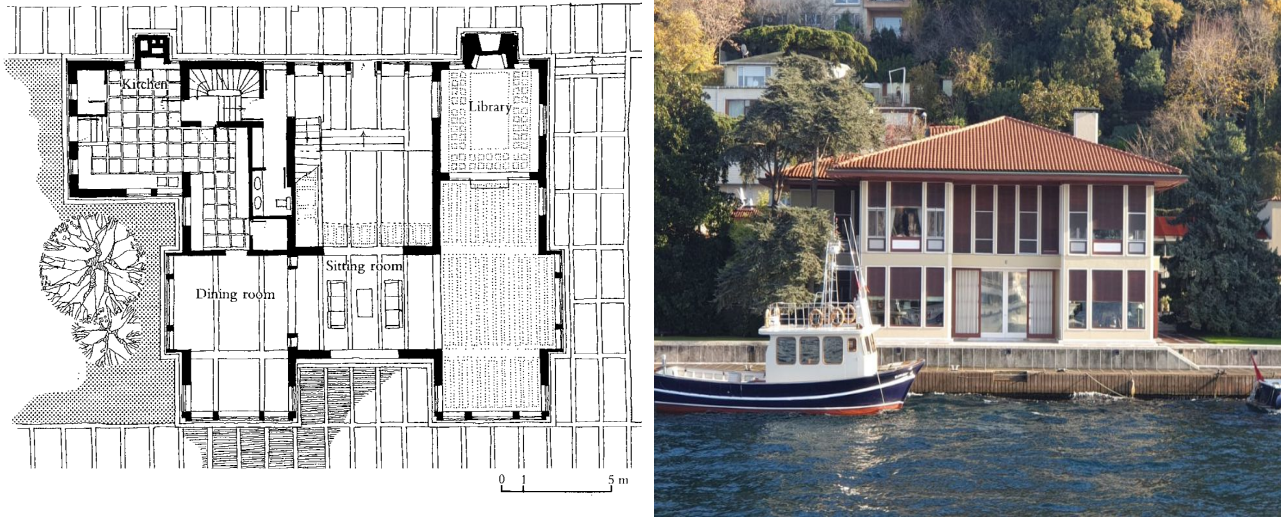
Suna Kırac Yalısı (Plan, Bozdoğan, 1987, 47; Photo, Author)
